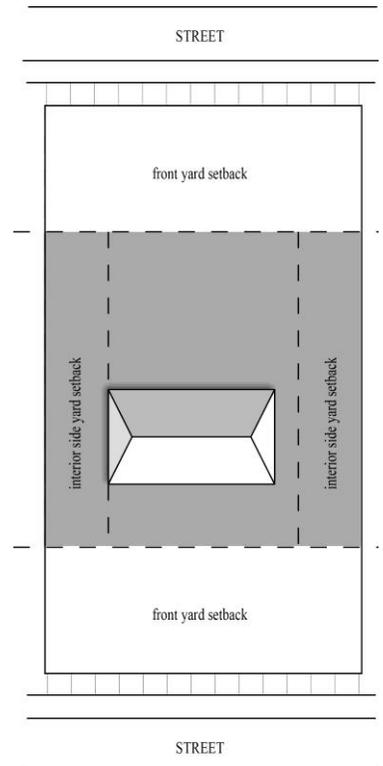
Residential Parking Locations: Through Lot. Parking is allowed in shaded areas and on driveways in approved locations.
